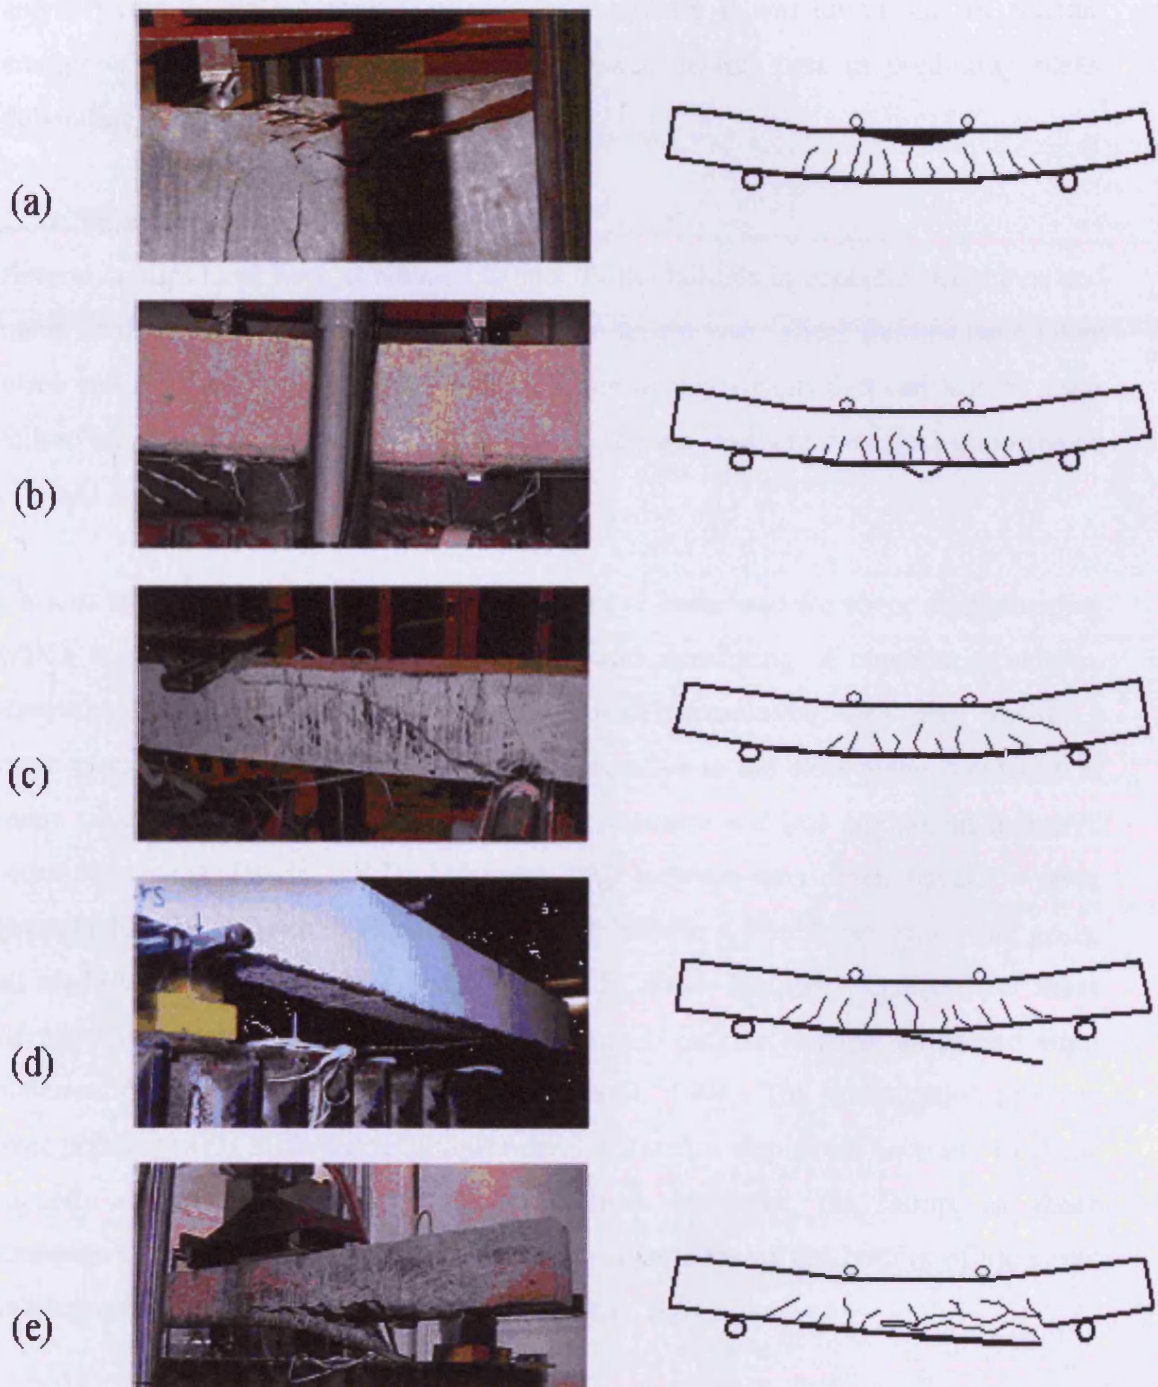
Failure modes of FRP strengthened RC beams: (a) compression failure; (b) rupture of FRP strips; (c) shear failure; (d) delamination of FRP strips and (e) concrete cover separation.
